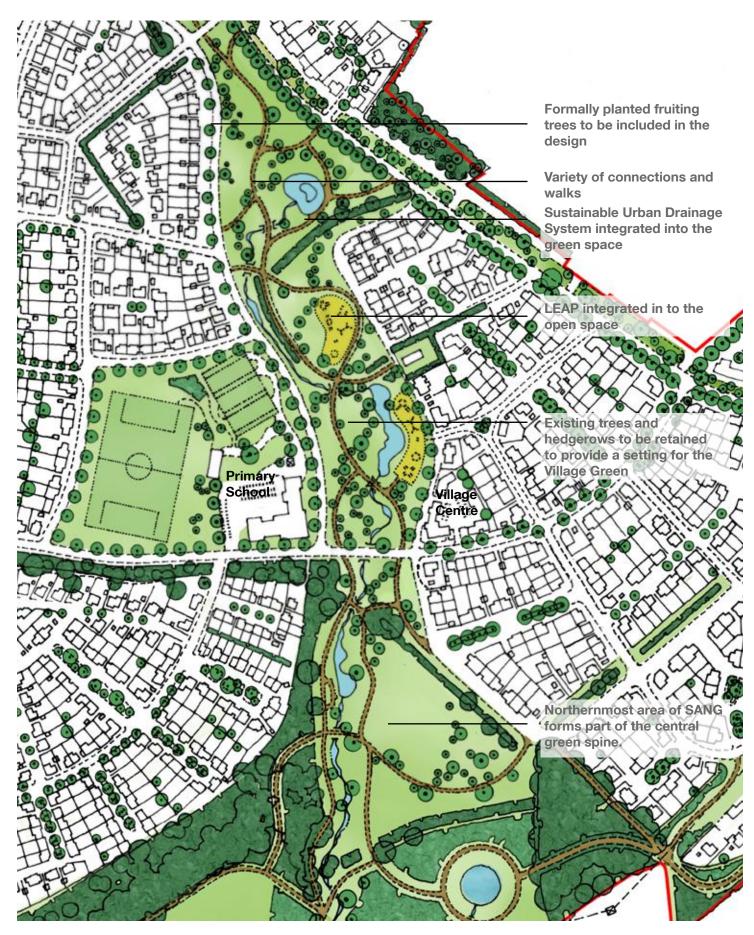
PARAMETER PLAN B: GREEN INFRASTRUCTURE & OPEN SPACE 75
